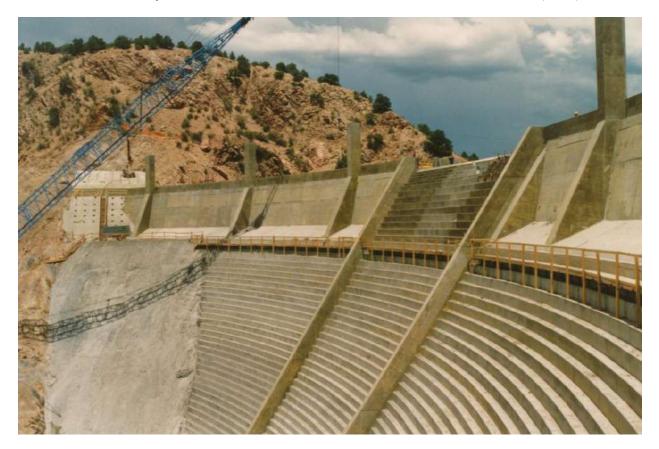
Concrete overtopping protection for Santa Cruz Dam in New Mexico. Splitter piers were provided for overtopping of the entire dam crest (Reclamation).
